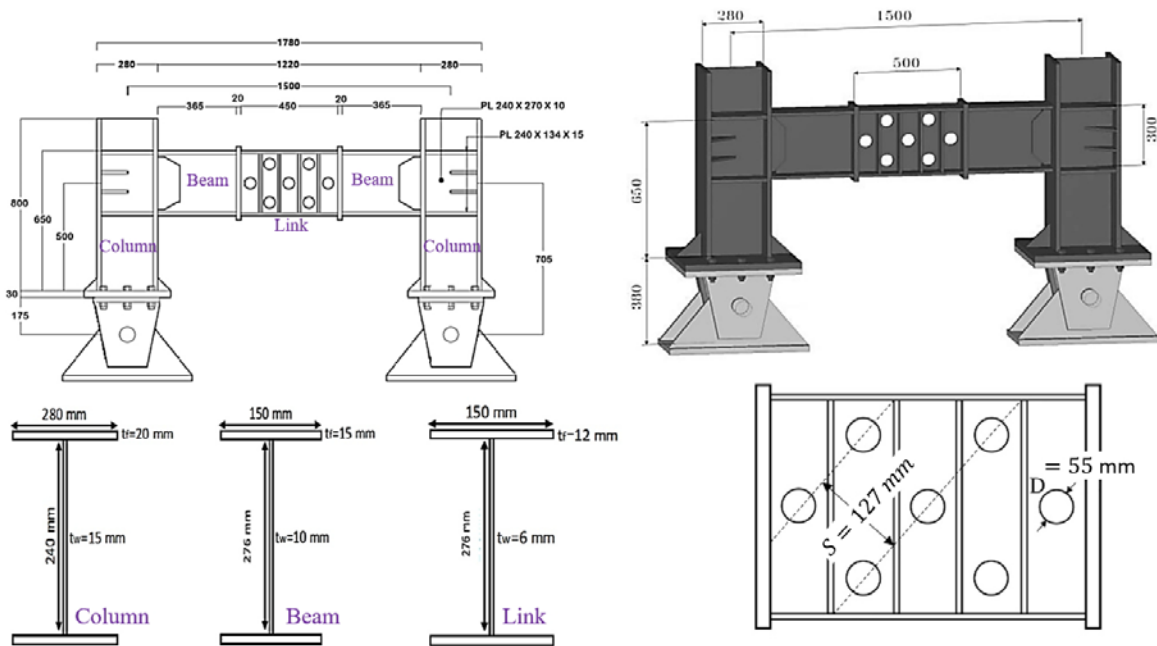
Geometrical and sectional properties of the modeled specimen [5]
